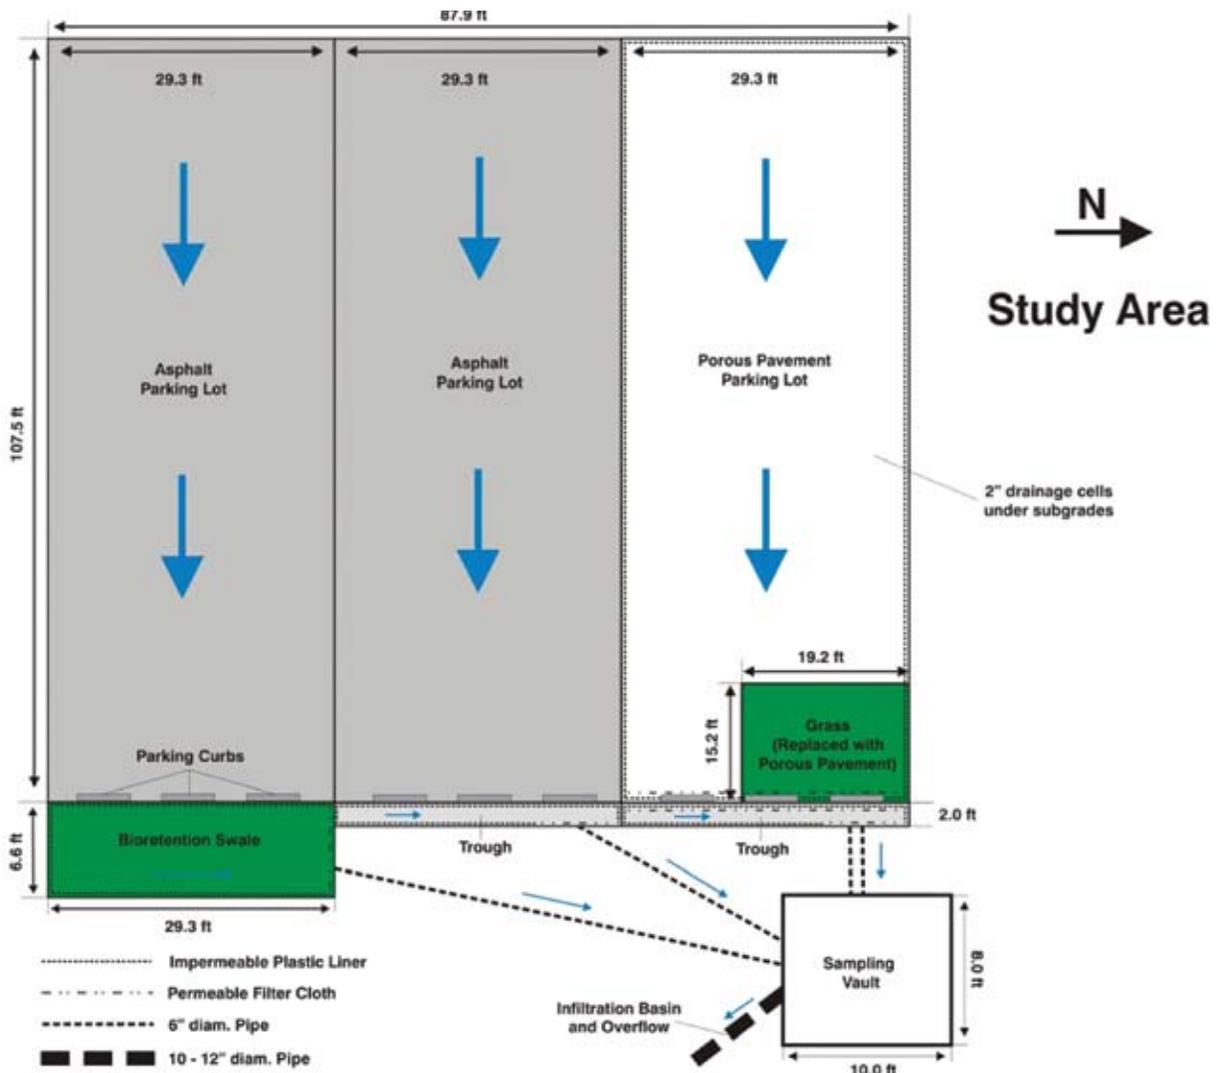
The Seneca College test site evaluates runoff directly from asphalt, from asphalt into a bio-swale as well as surface and subsurface runoff from permeable interlocking concrete pavement.
